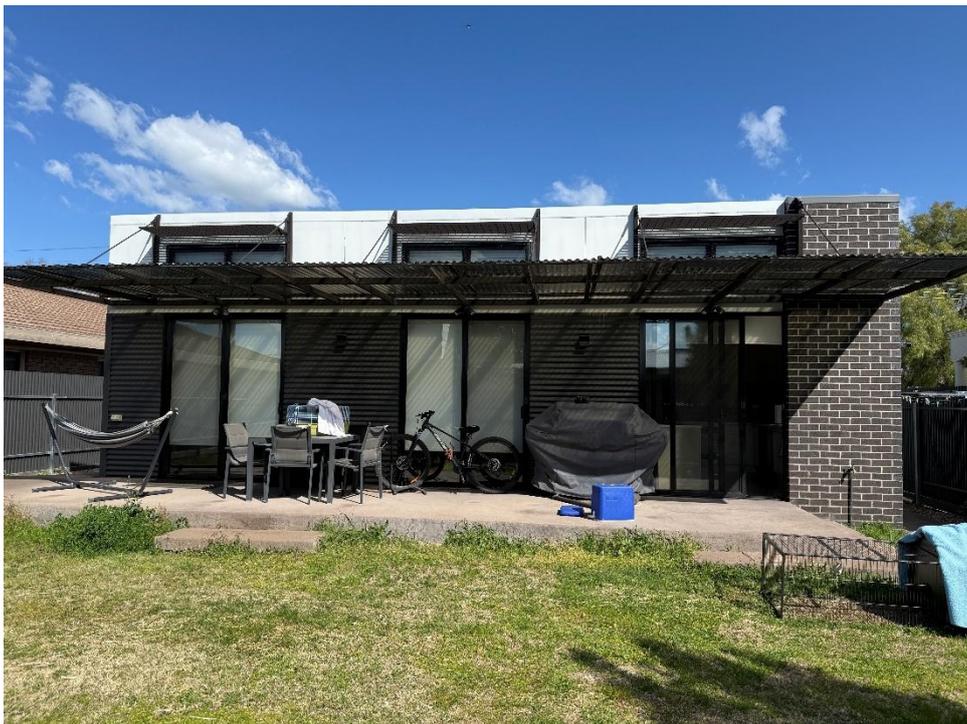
View of the outdoor entertaining area (rear concrete slab)
